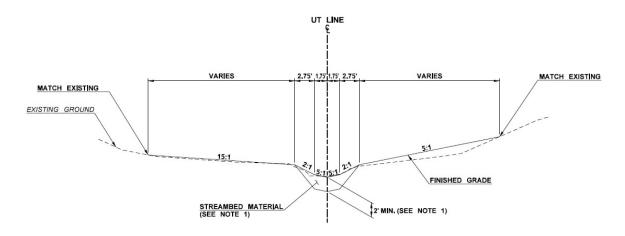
Reference channel-based design cross section for outside the culvert footprint
